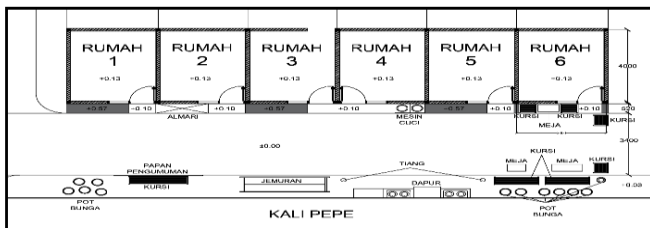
Plans for row houses no. 1 to 6 Pringgodani row houses
